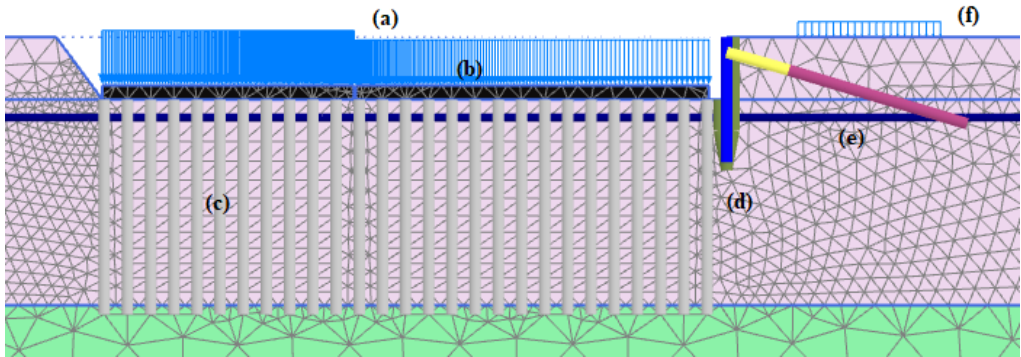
Mesh Model (a) Structure load (b) Foundation (c) DSM Columns (d) Mini-Piles (e) Anchor (f) Other Structure Load
